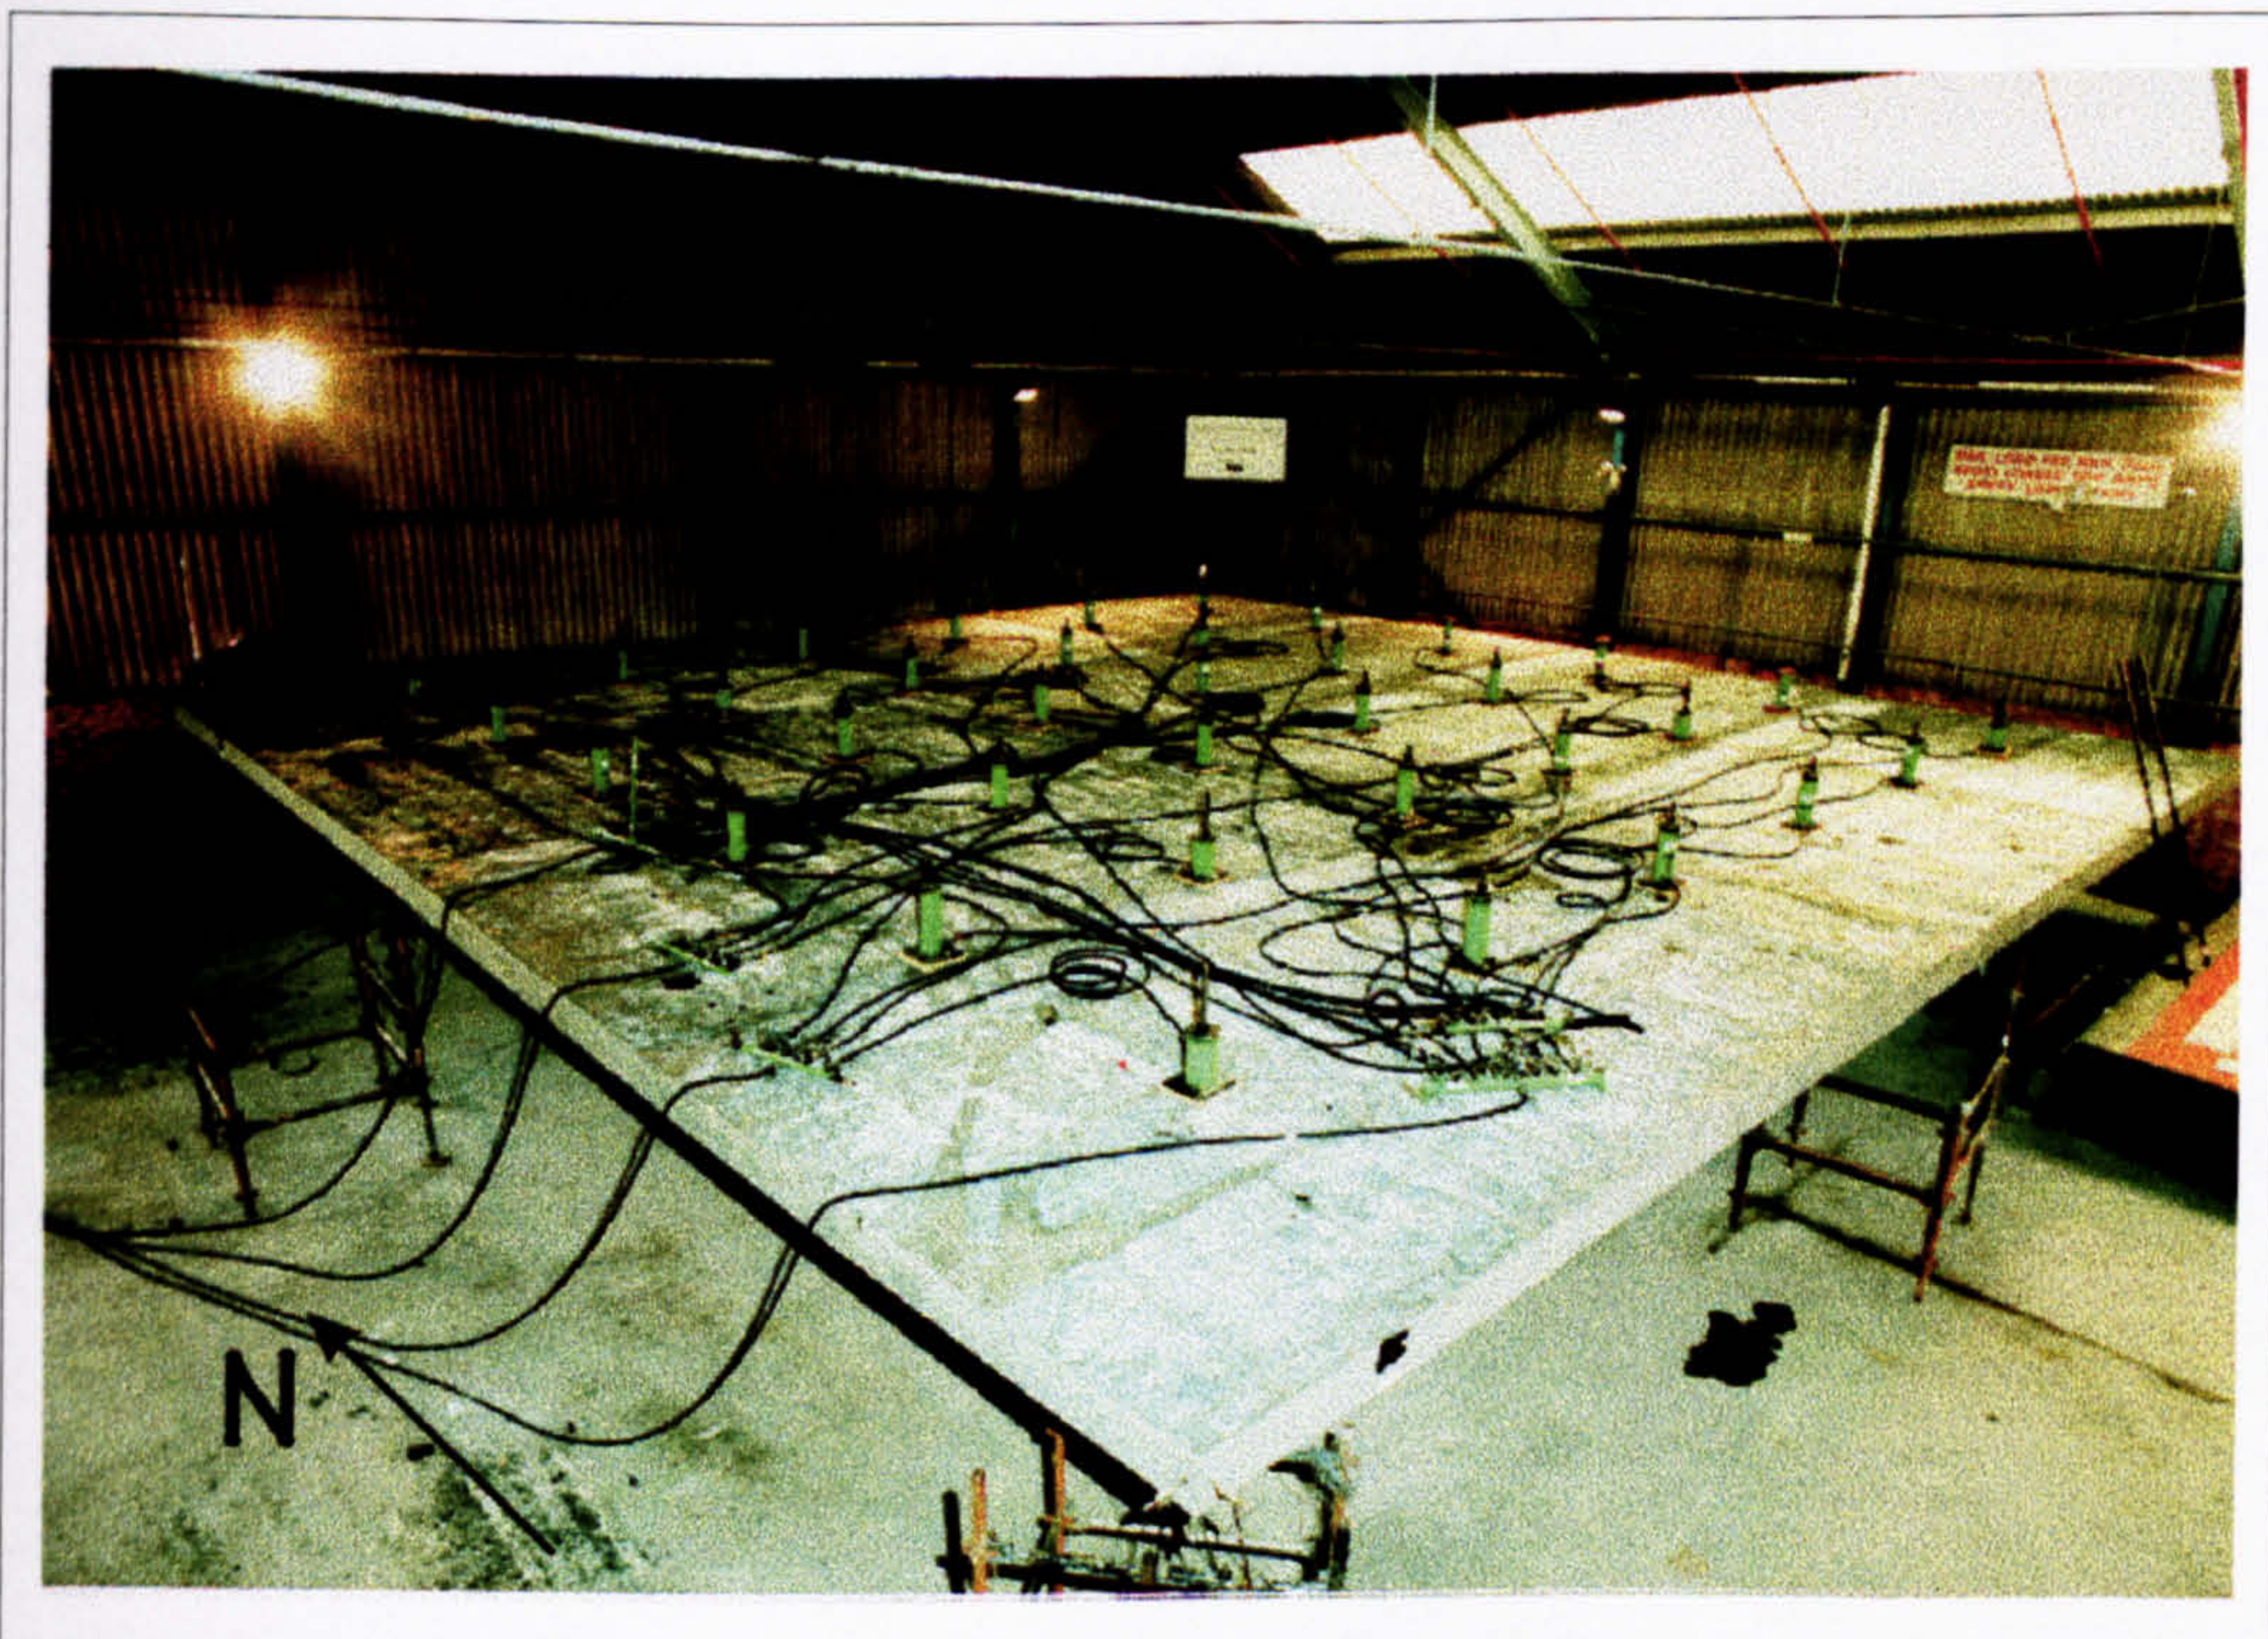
Structure B - Static loading test setup using 36 hydraulic jacks (courtesy of Taywood Engineering Ltd).
